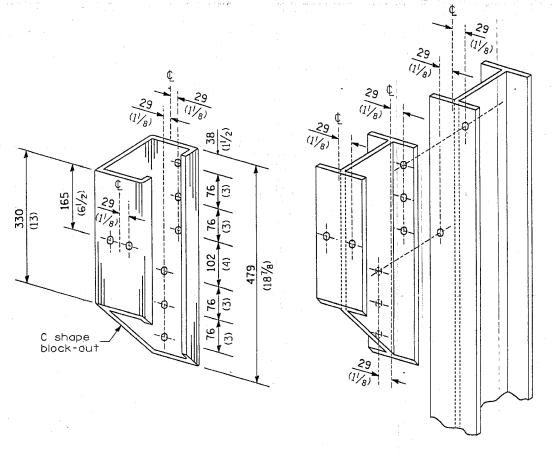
DETAIL OF GUARDRAIL SUPPORT AND END ANCHORAGE
